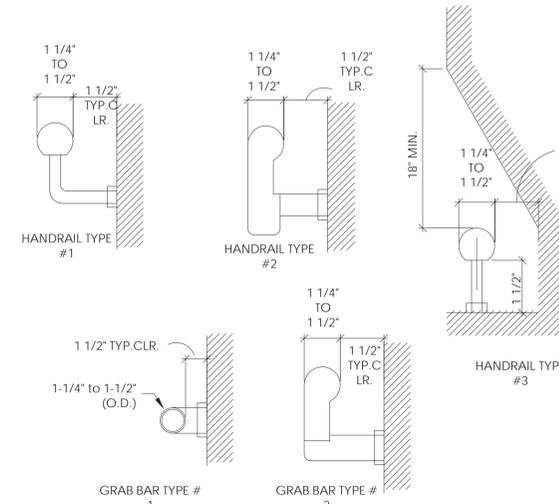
HANDRAIL & GRAB BAR PROFILES
